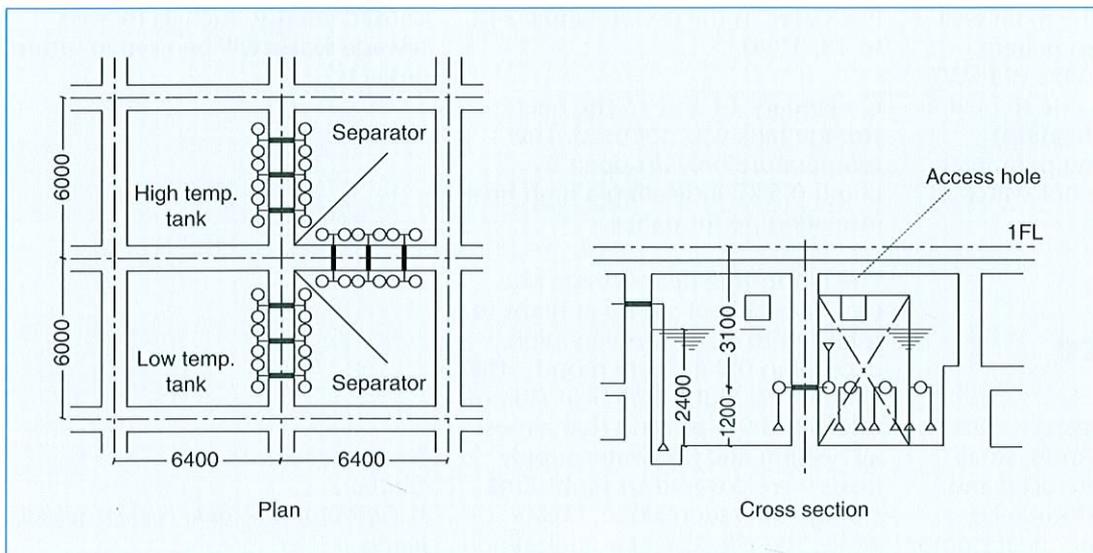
The Plan and Cross-section of the Heat Storage Tank.
